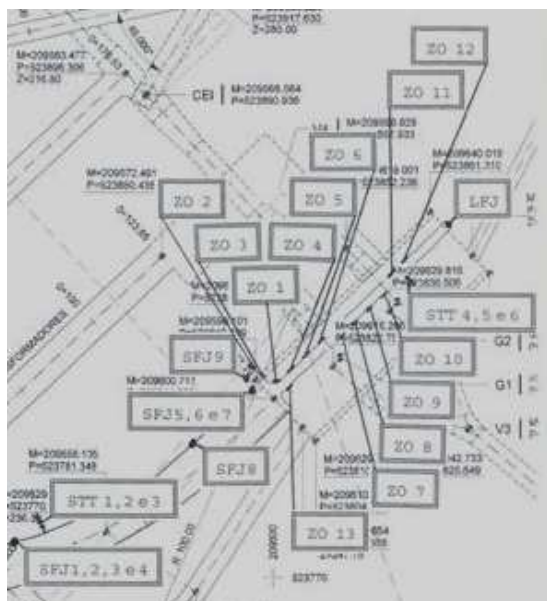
Locations of the different rock mechanics tests at the Venda Nova II powerhouse site (LFJ – large flat jack; SFJ – small flat jack; STT – stress tensor tube; ZO – jointing study)
